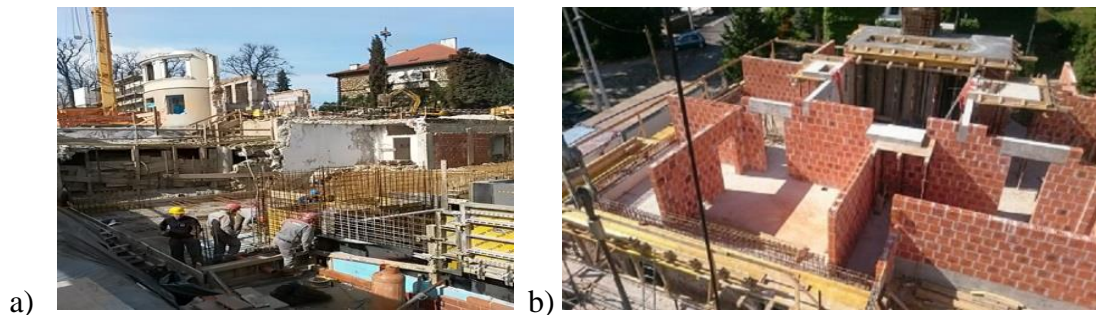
a) works on the construction of the walls of a new basement, b) the new partition walls
